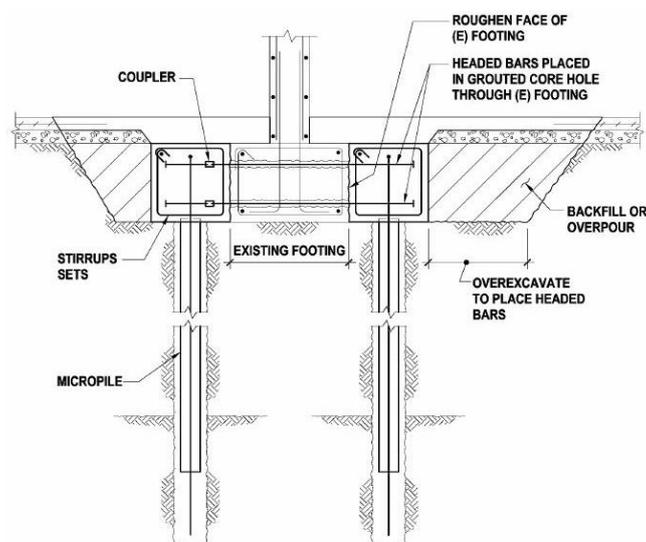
Section of micropile enhancement to existing strip footing [1].
